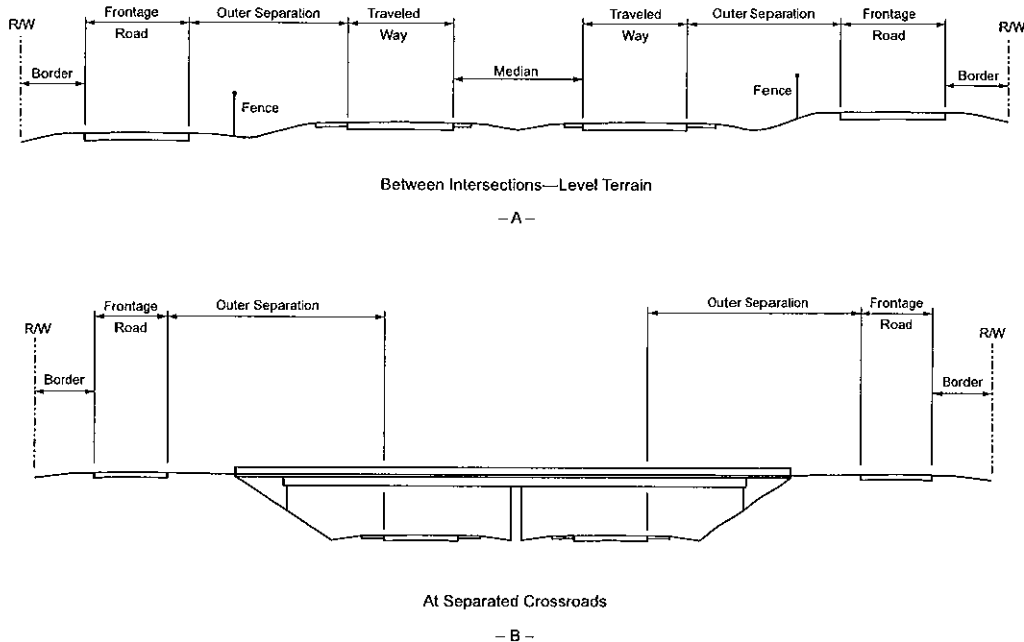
Cross Sectional Arrangements on Divided Arterials with Frontage Roads
